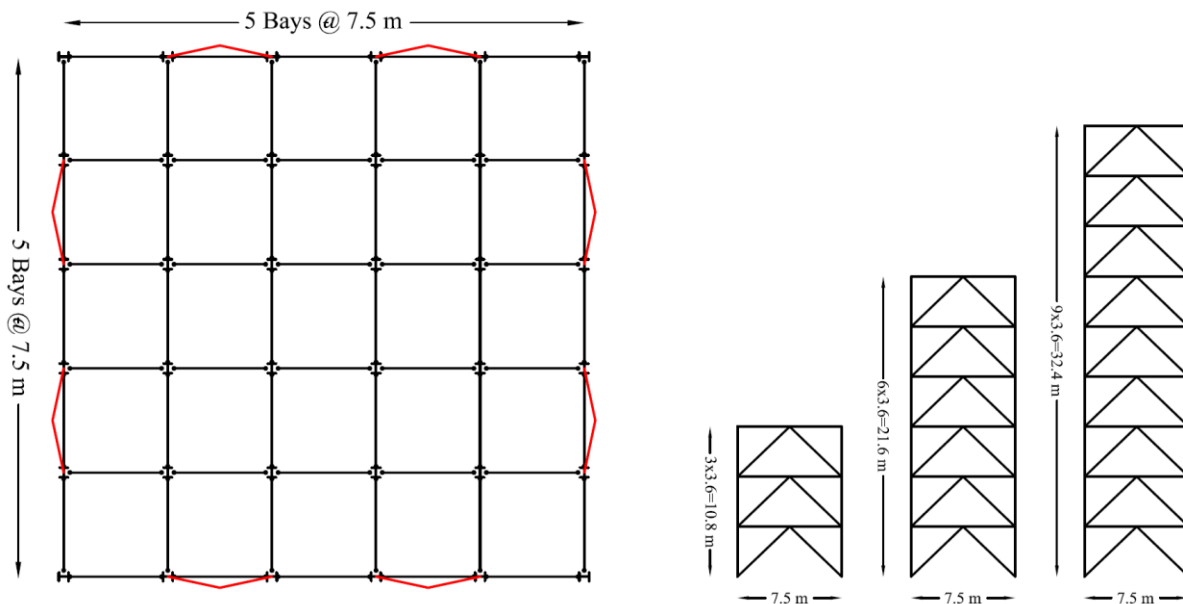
(a) Plan of 3-, 6- and 9-story BRB frames, and (b) the geometry of the 2D braced bays.
